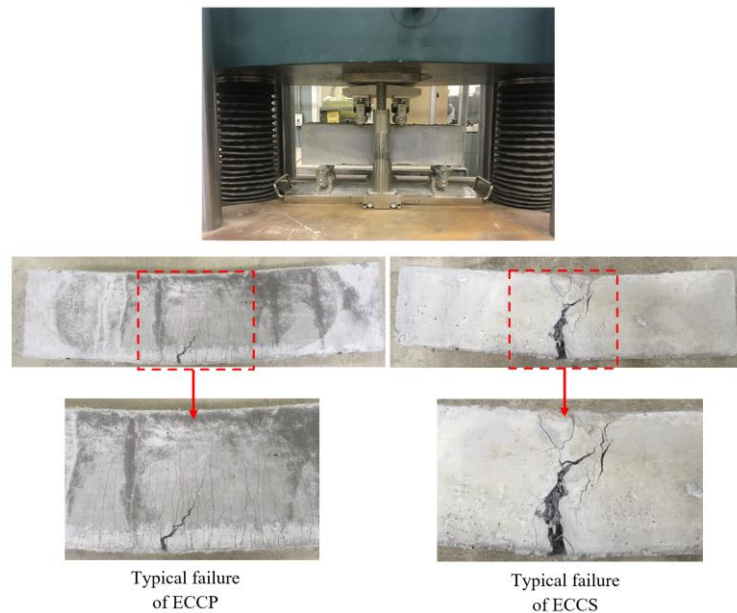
Typical cracking pattern of ECCP and ECCS at failure
